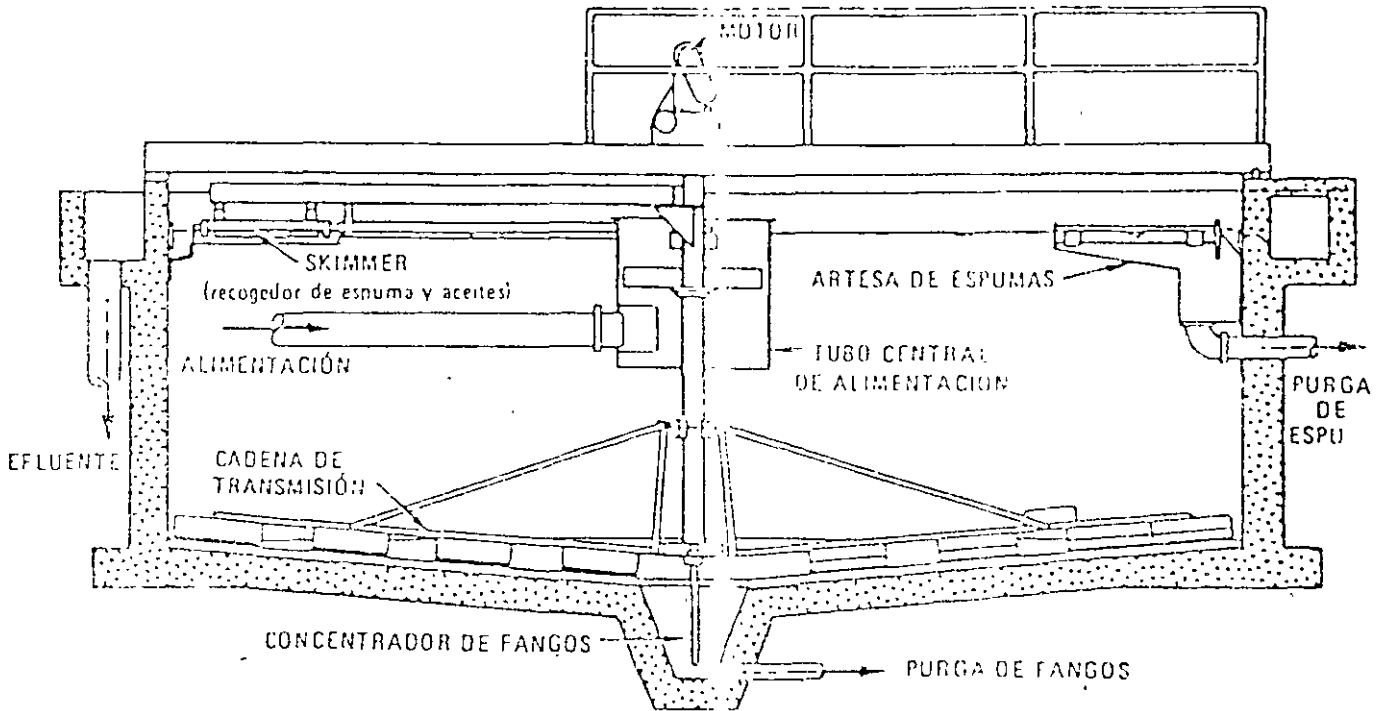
Typical Plan and Section of a Circular Center-Feed Clarifier
